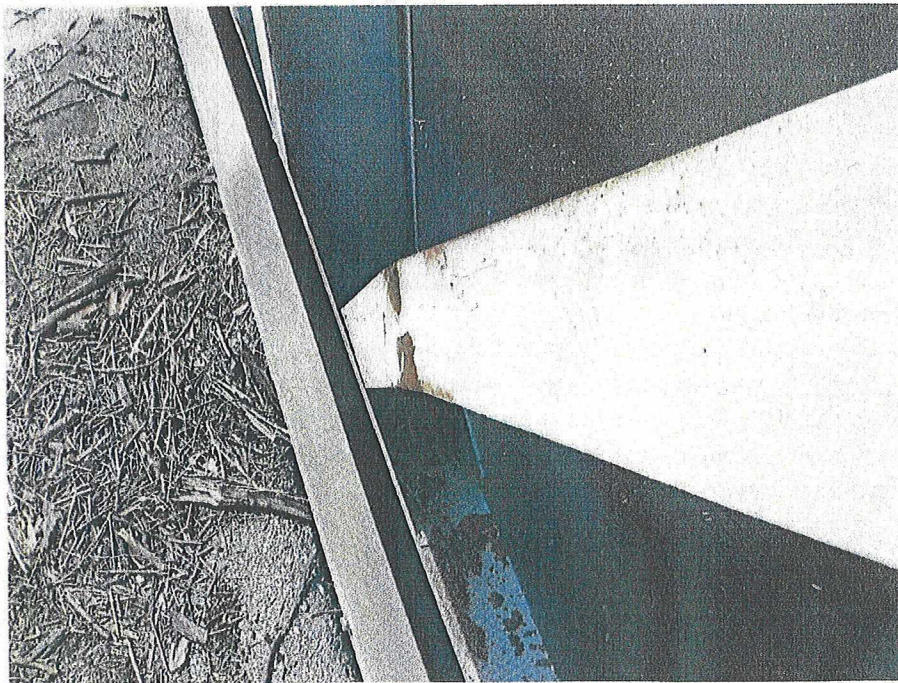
Flood damaged vertical L₄-U₄, span 2, east truss.
